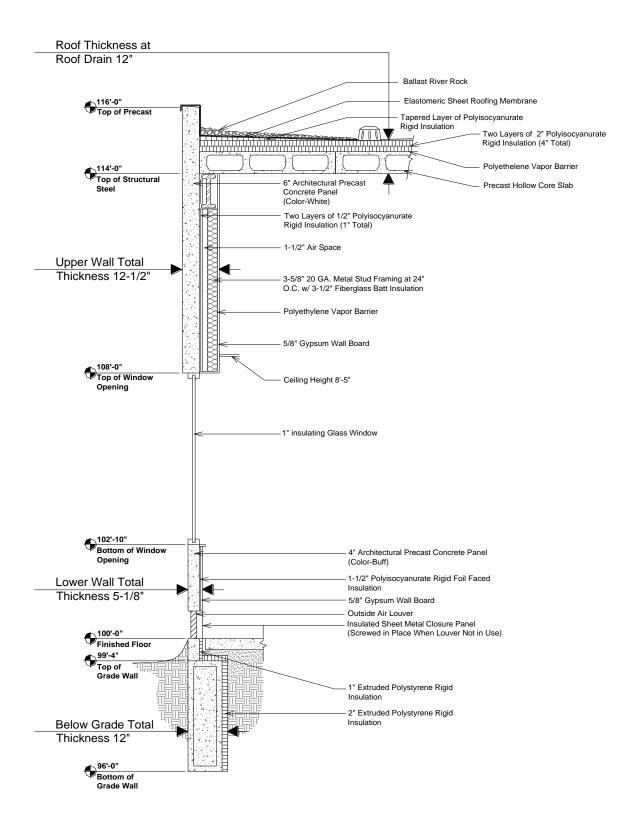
Exterior wall center section cross-section, image taken from ERS (2010)
